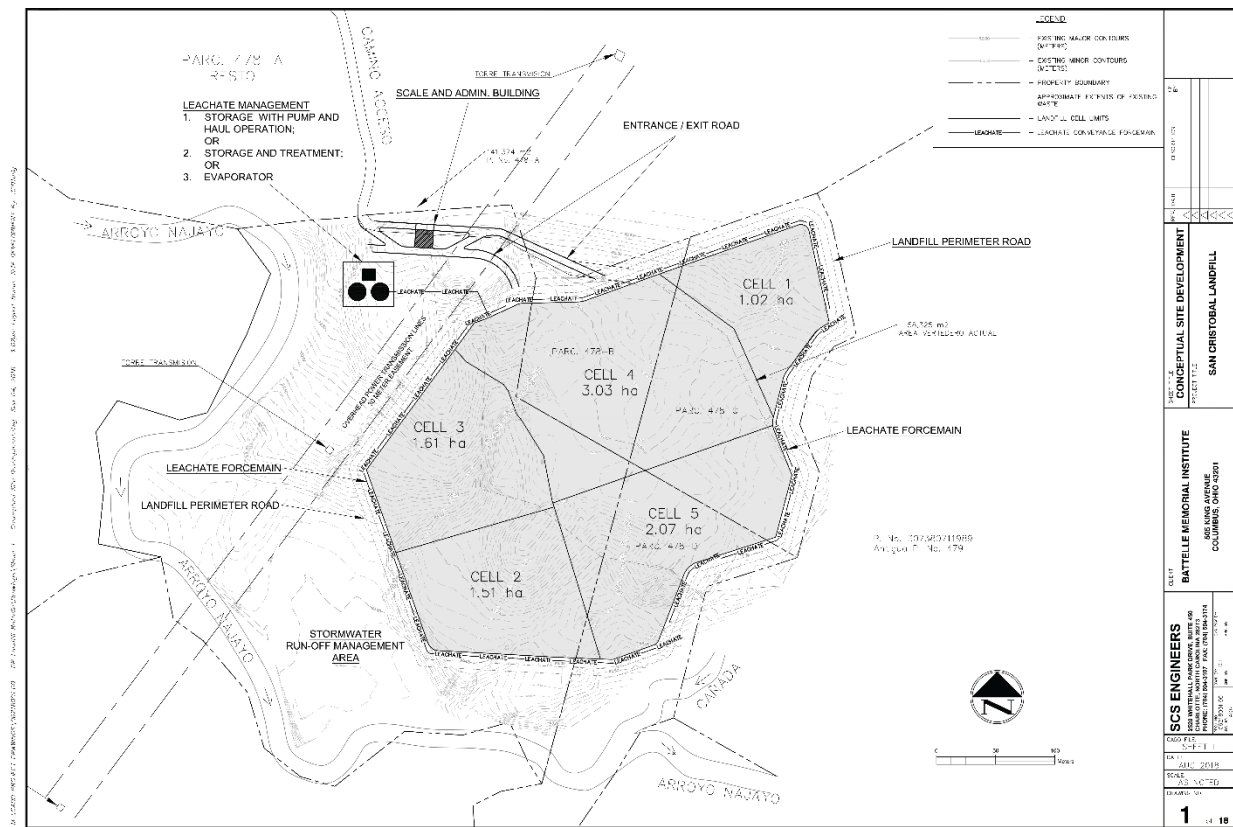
Conceptual Proposed Engineered Landfill Cell Layout
